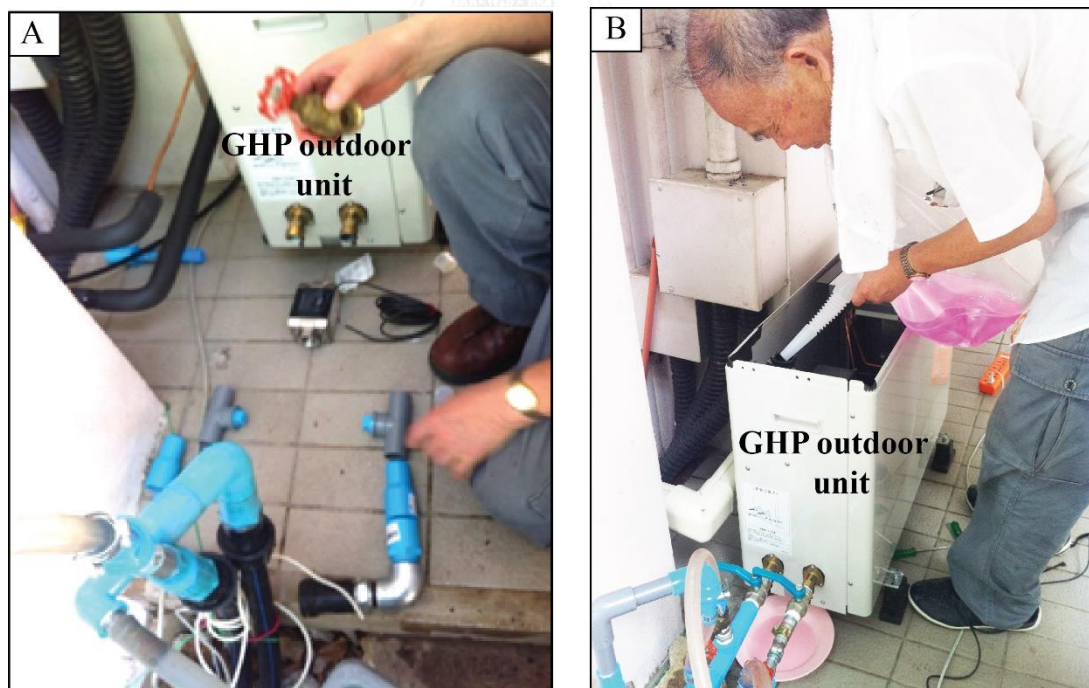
(A) Connecting inlet and outlet HDPE pipes (HDPE pipes of well nos. 1&2) to GHP outdoor unit without any leakage (B) Filling anticorrosion into GHP outdoor unit.
